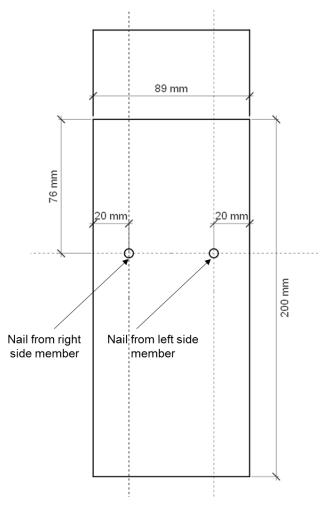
Nail locations for specimens with nails parallel to wood grain
